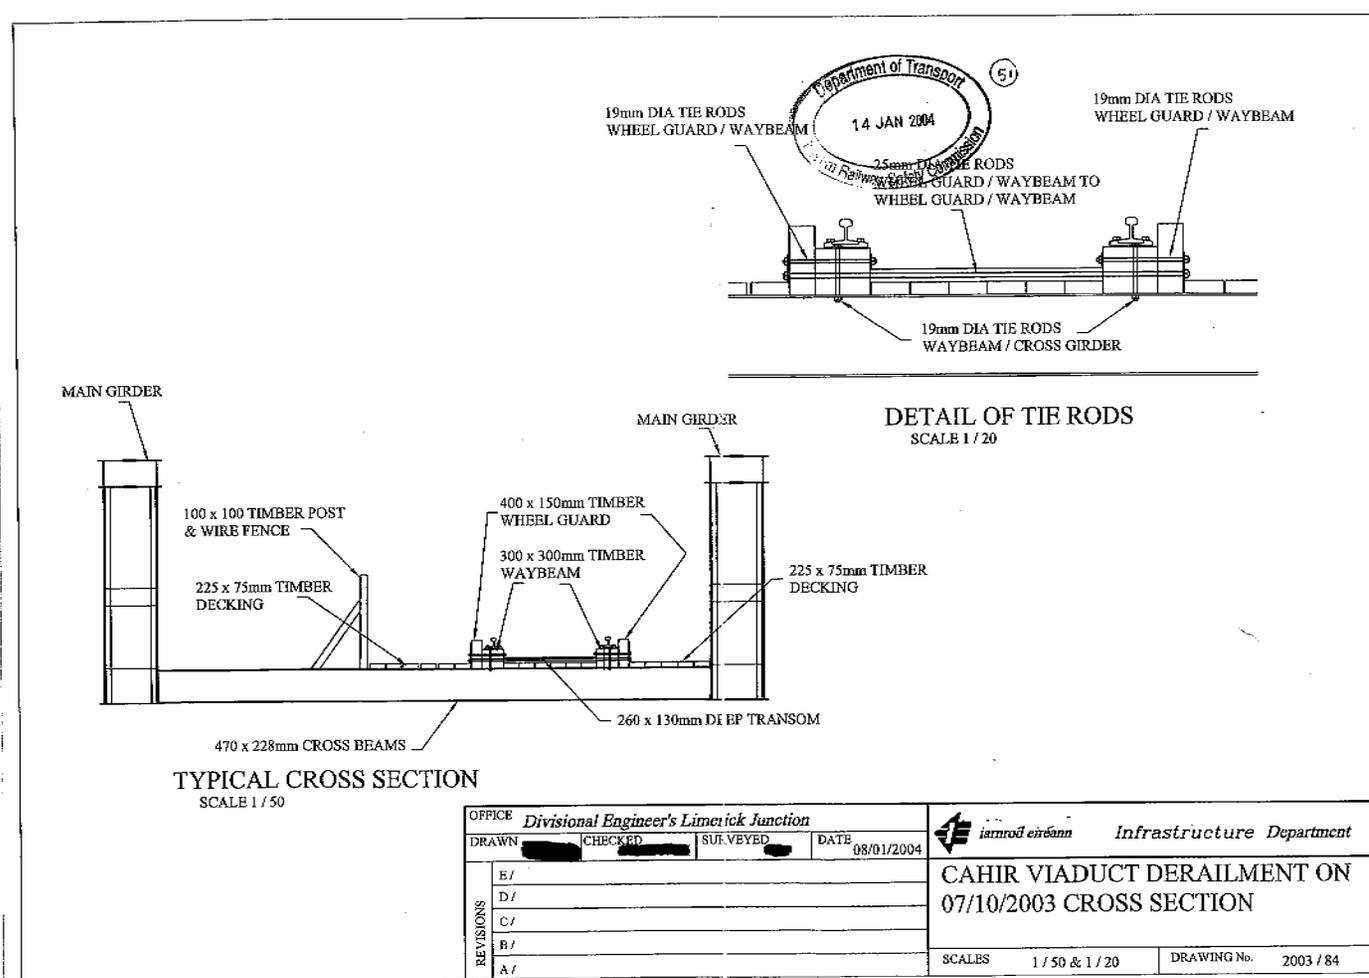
Cross-section of structure on 07/10/2003 (IE Divisional Engineers, 2004)
